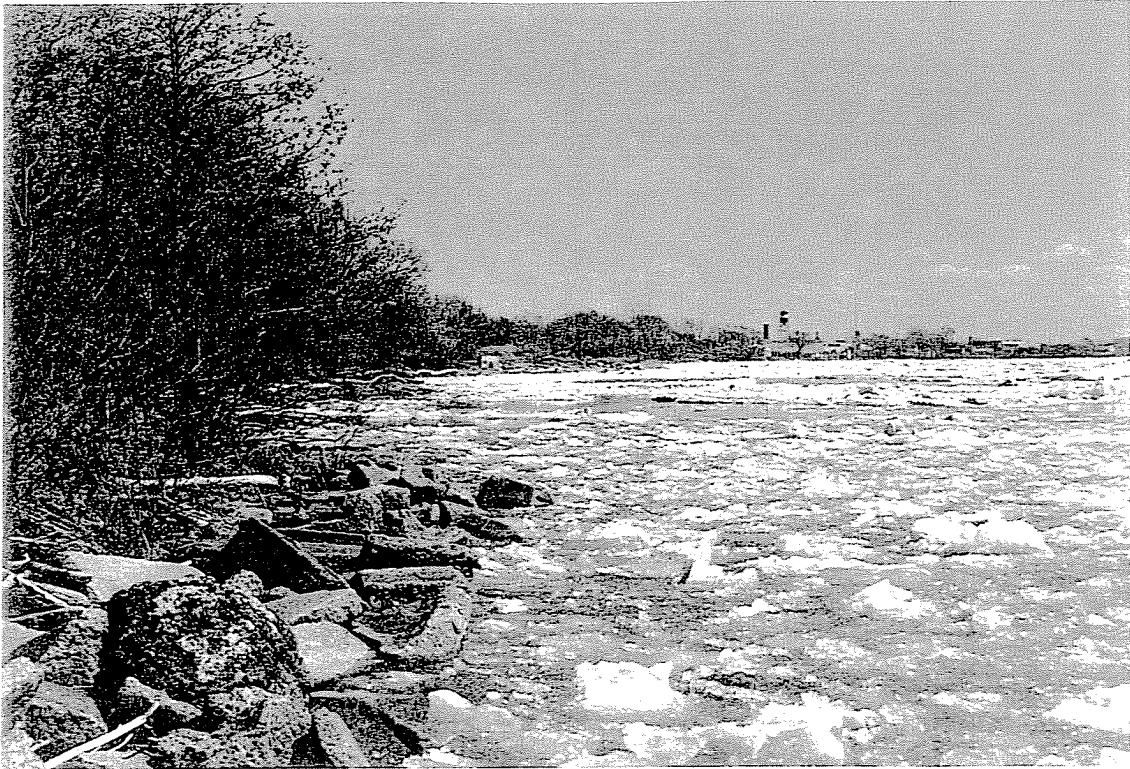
River and bank in the easternmost section of the project area showing old sidewalk remnants used as rip-rap facing southeast from the shore near the eastern park access road and groundwater well 5.
